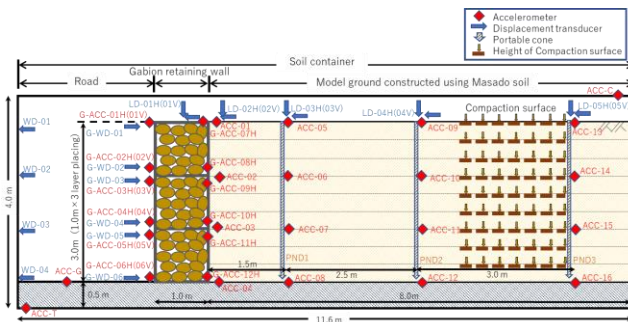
Cross-section of the full-scale gabion retaining wall experiment (revised from [6])
